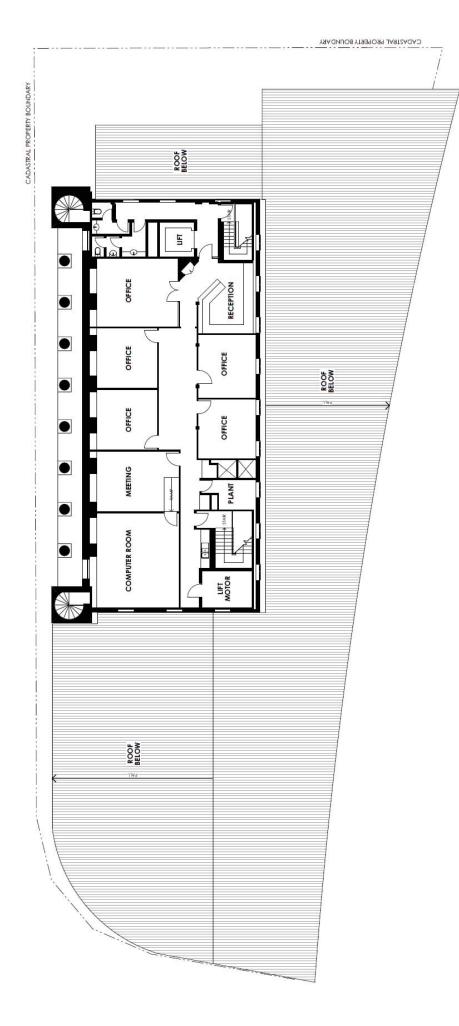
Floor Plan, Level 6 Source: ML Design 2016
